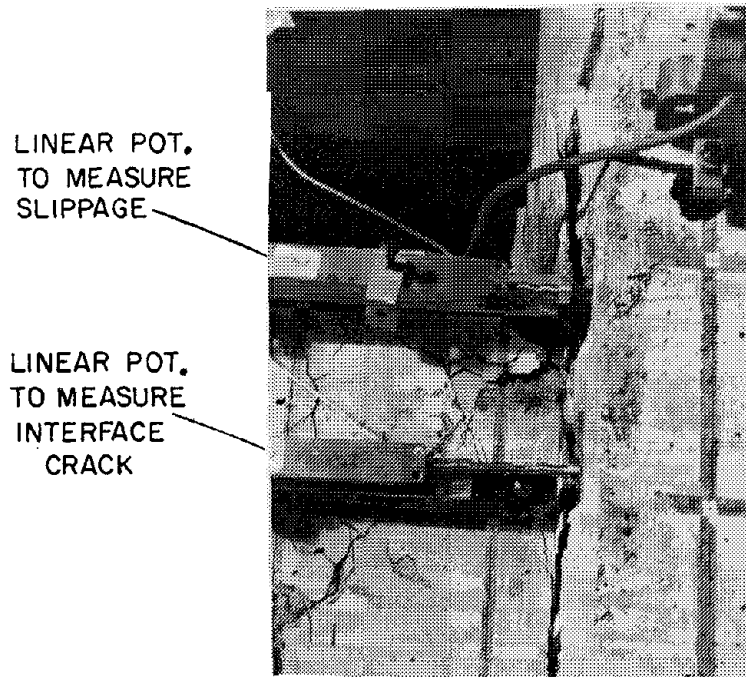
Gages Measuring Rebar Slippage and Interface Crack Width
